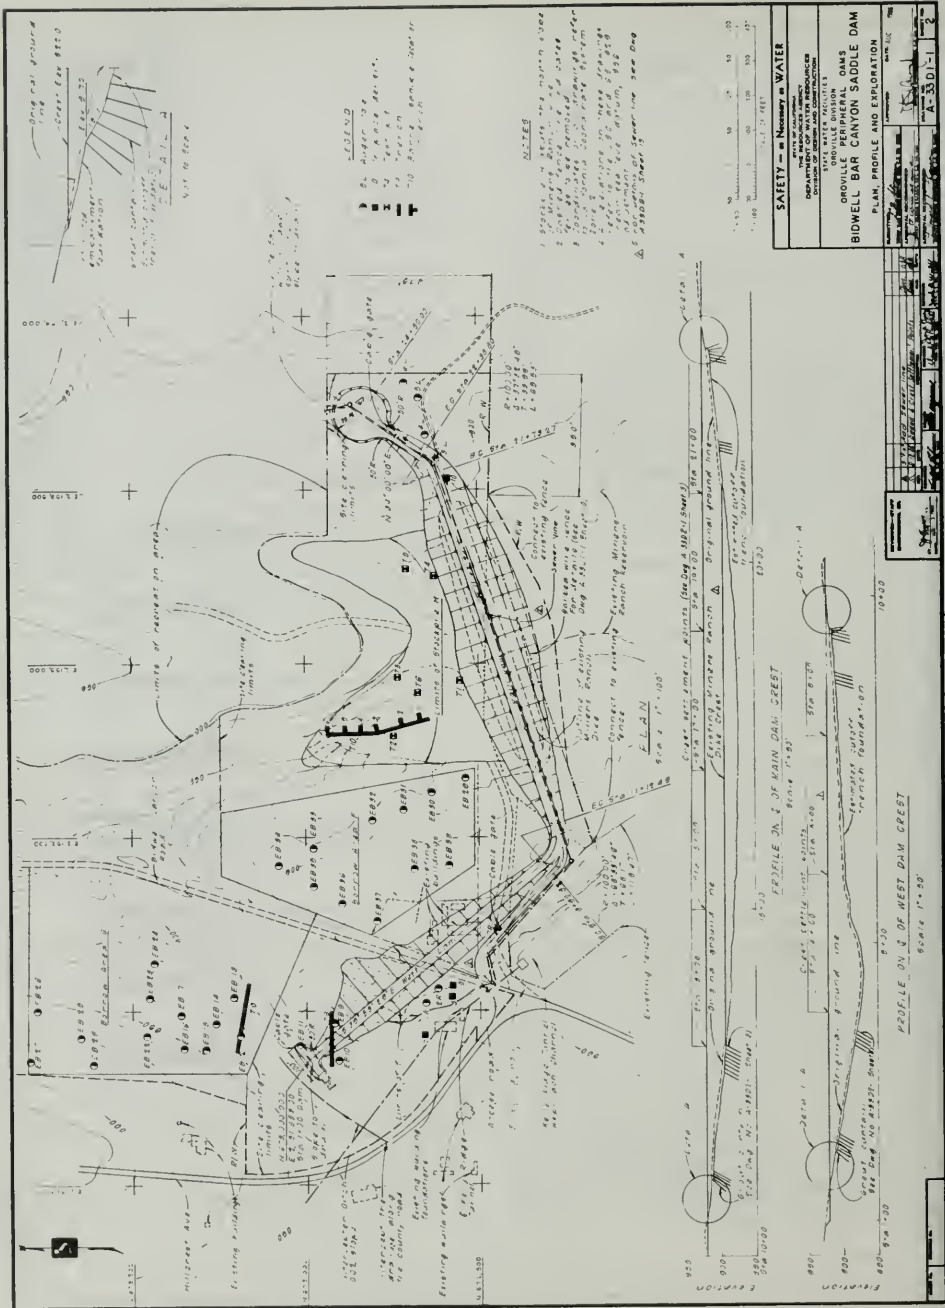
Bidwell Canyon Saddle Dam—Plan and Profile
